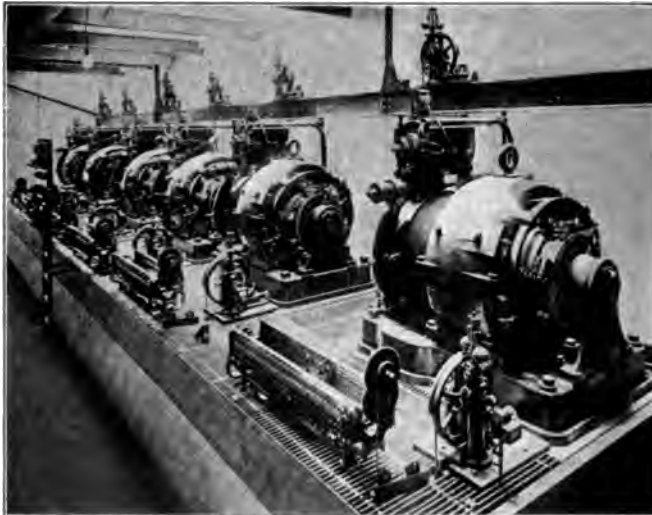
AN INSTALLATION OF BALL-BEARING TRACTION MACHINES
